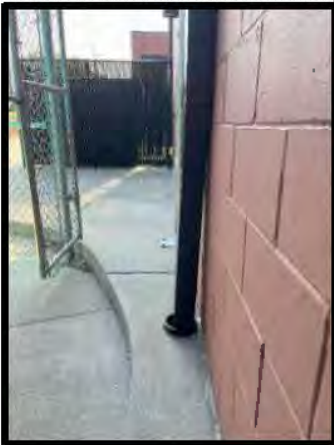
Outlet at Drainage Basin – 8/28/2024
